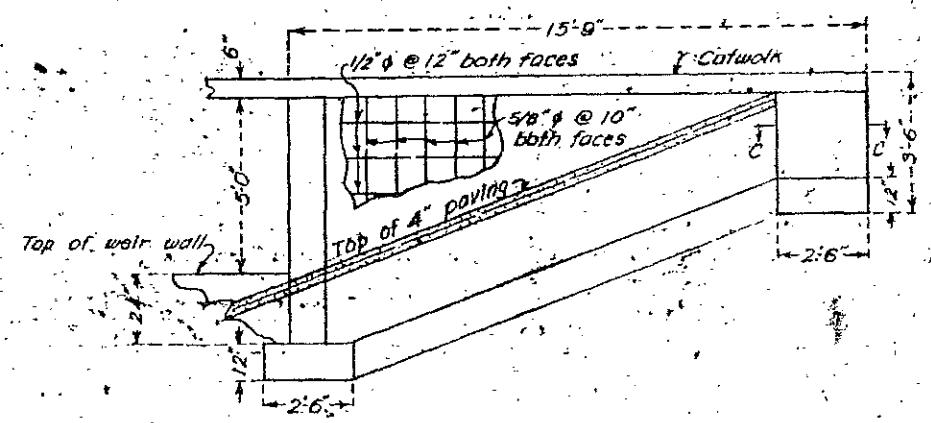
DETAIL (At contraction joint) Scale: 1/2" = 1'-0"
